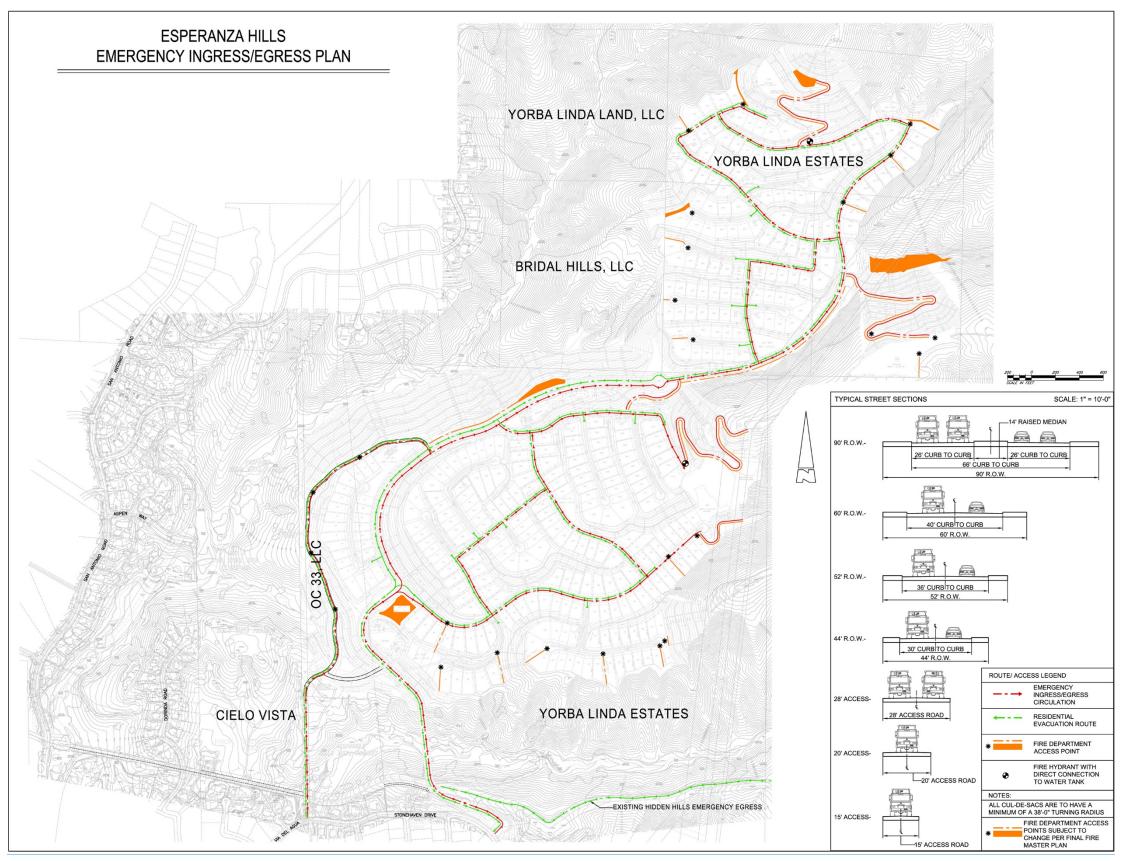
Exhibit 7 – Emergency Ingress/Egress Plan, San Antonio Road Access Configuration
